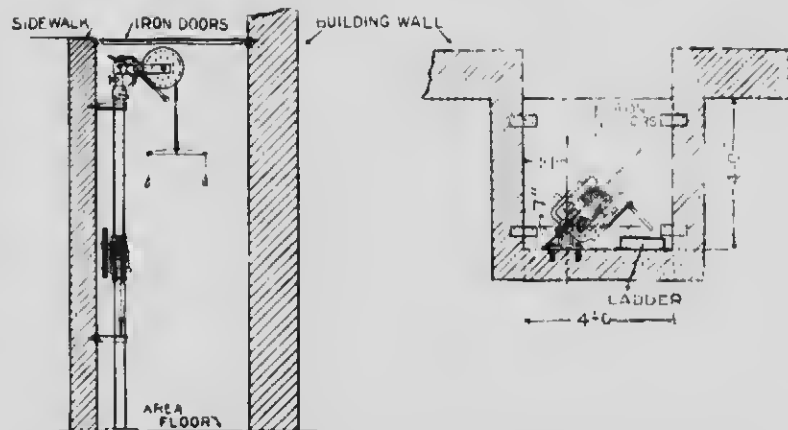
PLAN AND ELEVATION SHOWING APPLICATION OF G. & G. TELESCOPIC HOIST TO AREA BETWEEN SIDEWALK AND BUILDING WALL. Note: Area shown above is for use only for overhead Crane Hoist or Hoist with Electric Motor.
